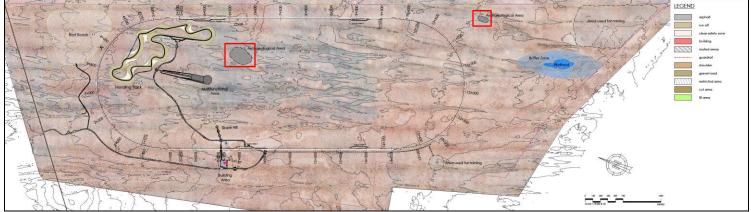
Proposed site layout plan for the MBSA high speed test track on Farm 149/6 Steenkampspan. The Grade 3B sites (red polygons) will not be impacted by proposed development activities. The sites have been declared `No-Go' areas.
